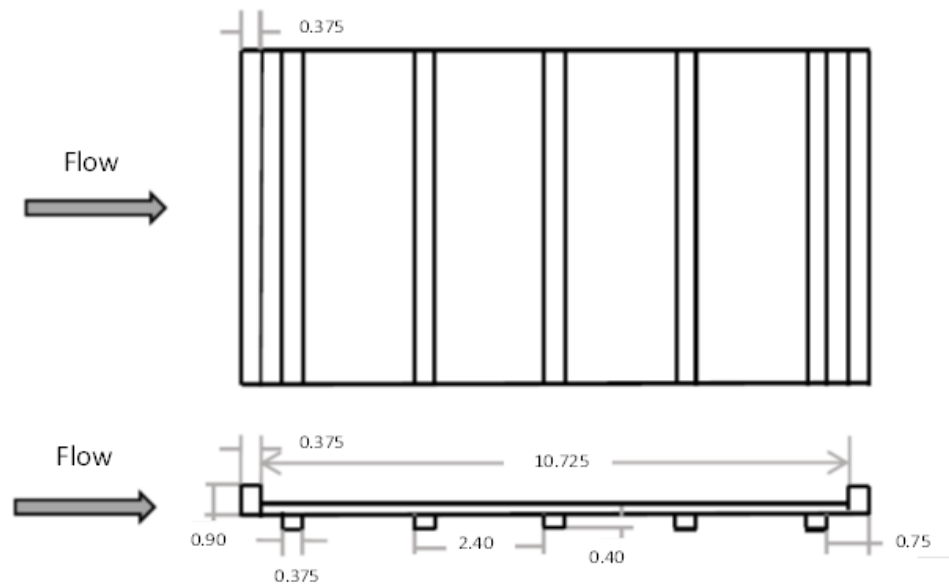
Model bridge dimensions for Georgia DOT bridge at a scale of 1:45 (All dimensions are in inches)
